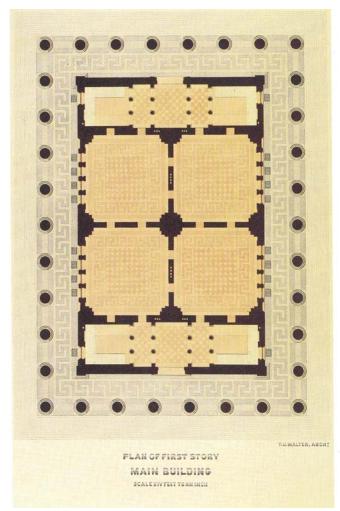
"Plan of First Story, Main Building by T. U. Walter (Girard College History Collections)
